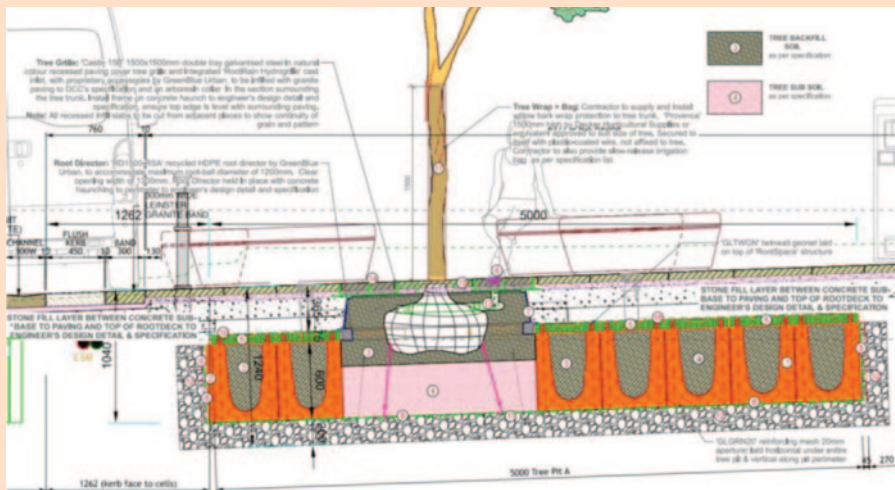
Design and construction: section indicating design detail including levels, based on initial survey, showing underground drainage including attenuation details, pavement material layers, surface gradients, interface points, tree pits.
